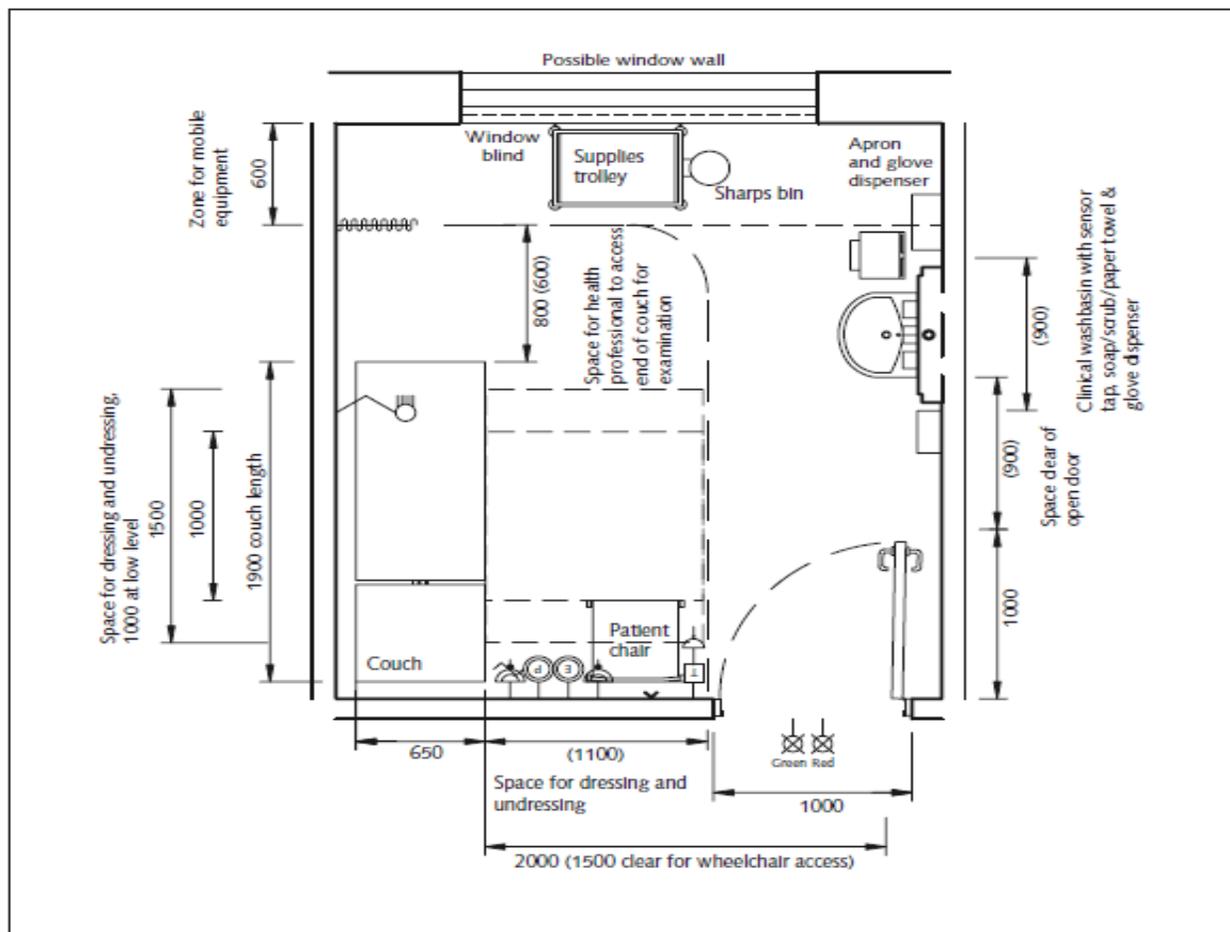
Double-sided couch access examination room Source: Department of Health Estates and Facilities Division, 2007
